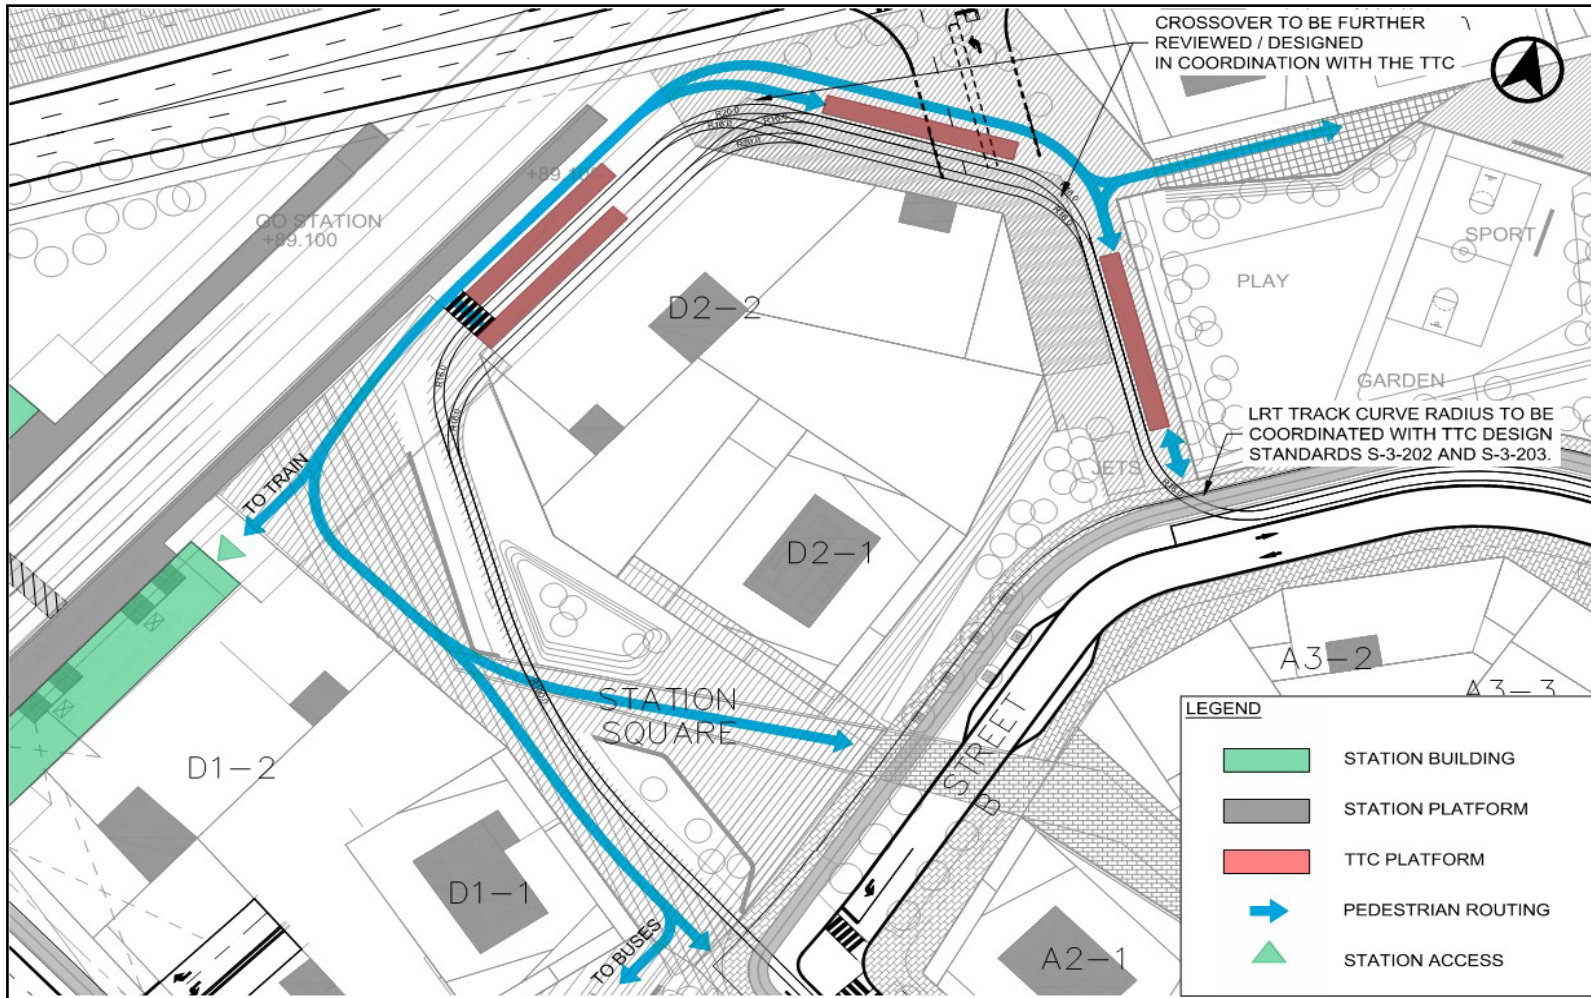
Longer Term Horizon (2041) Configuration of Proposed Streetcar Platforms
